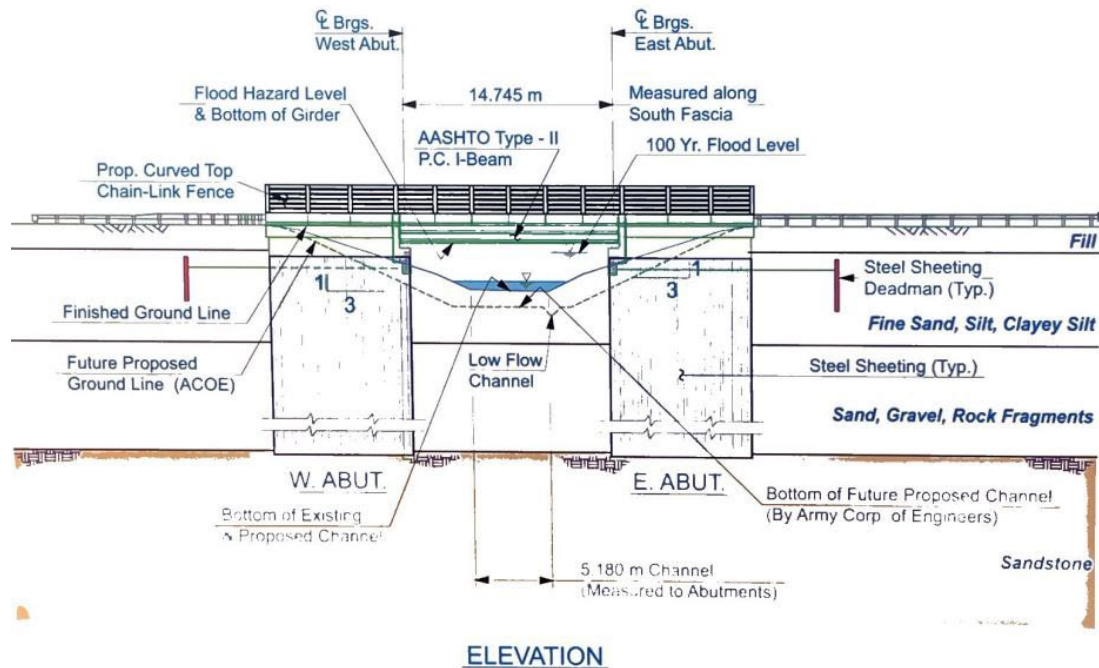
A substructure redesign for Route 4 Bridge over Sprout Brook (from Nucor Skyline, 2021).
